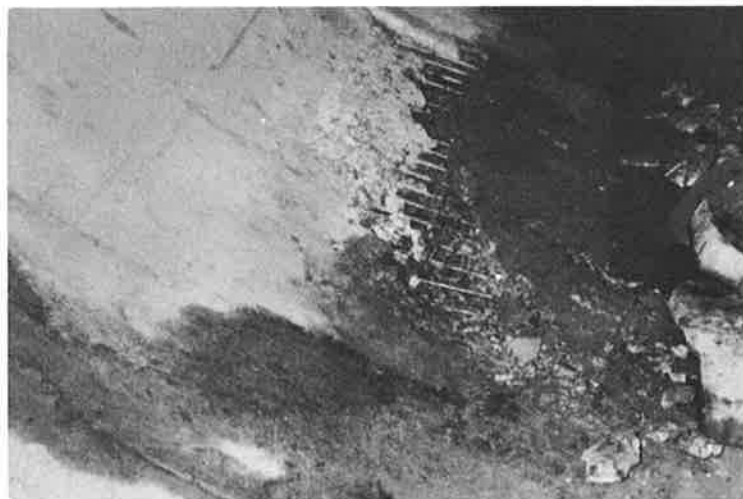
Advanced stage of spalling; note how reinforcement has pulled away from concrete wall. This 108-in. pipeline was repaired by pressure grouting through holes drilled at lower quarter points, after which new concrete protective cover was applied. Line has served 18 years since repairs were made and gives promise of a long satisfactory life.
